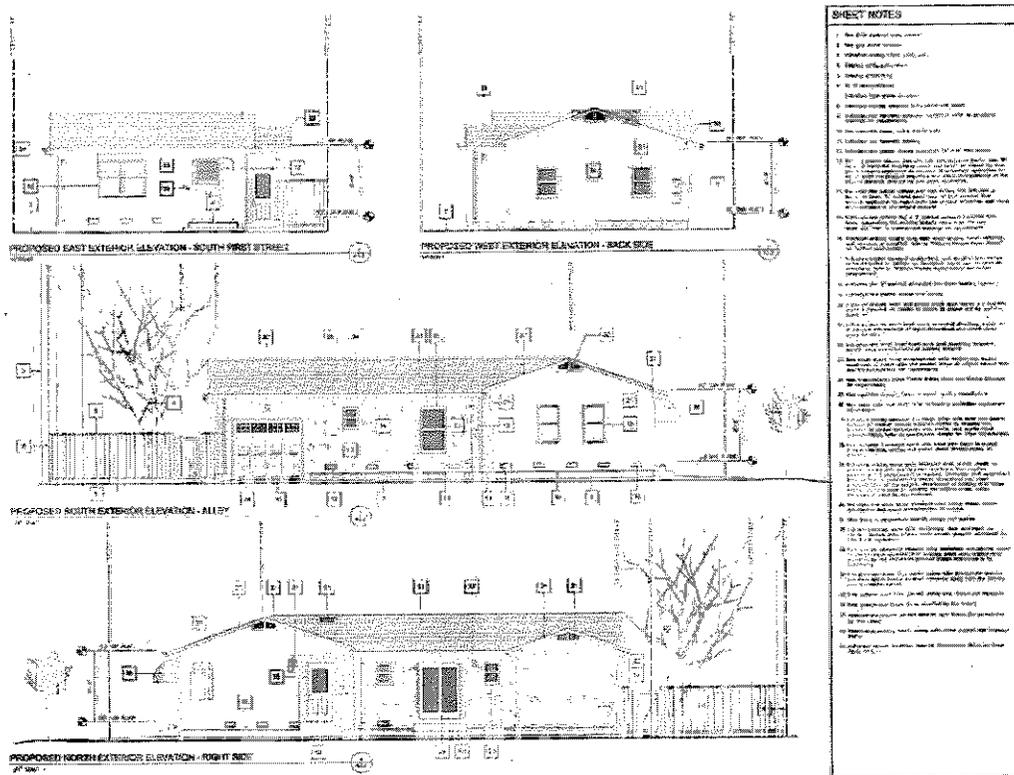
Architectural drawings of the proposed exterior elevations showing the new room
